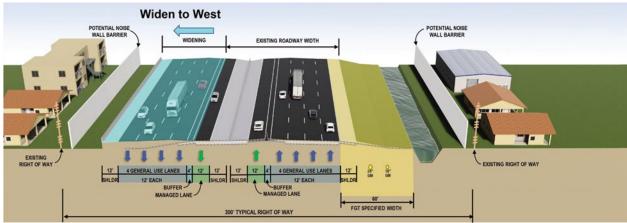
Typical Section Segment 2 - Build Alternative 1 - Widening to the West
